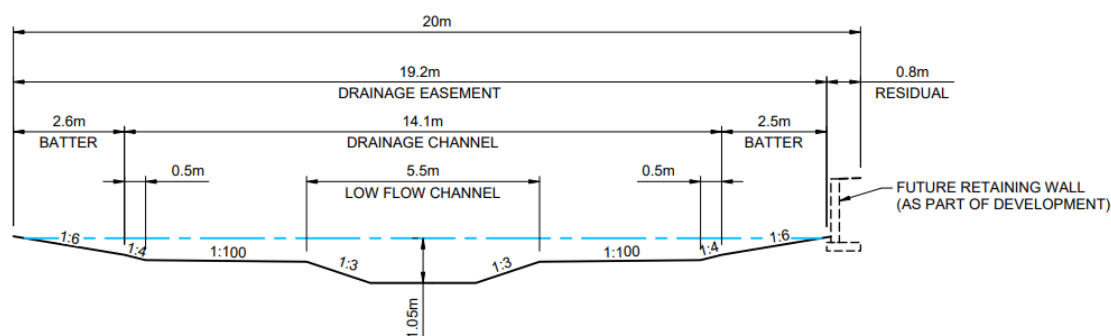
Typical Channel Cross Sections (Downstream of OSD Outlet)
